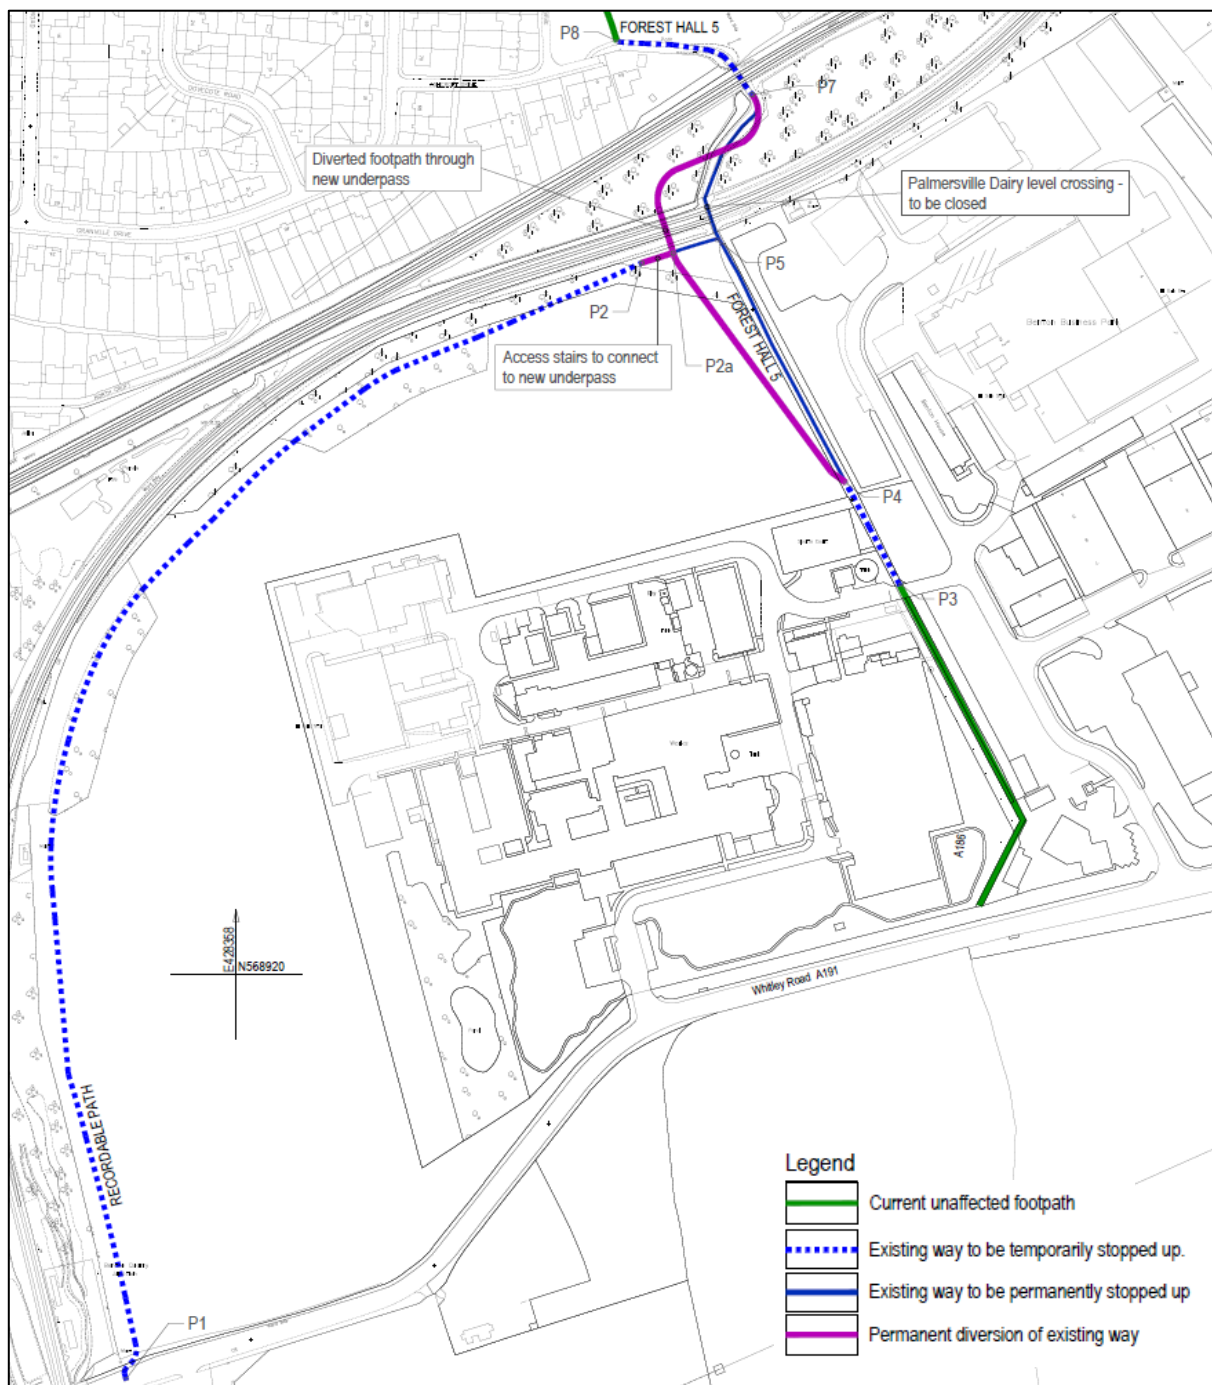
Rights of Way Plan (RoW-Sheet 1-Ro4) showing recordable path, existing footpath, and proposed path diversion.
